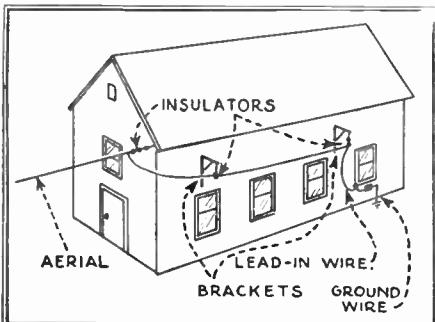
In order to obtain best results, the lead-in wire should be kept free from buildings. Where necessary, brackets should be erected to support the wire at least 18 inches from the building.
